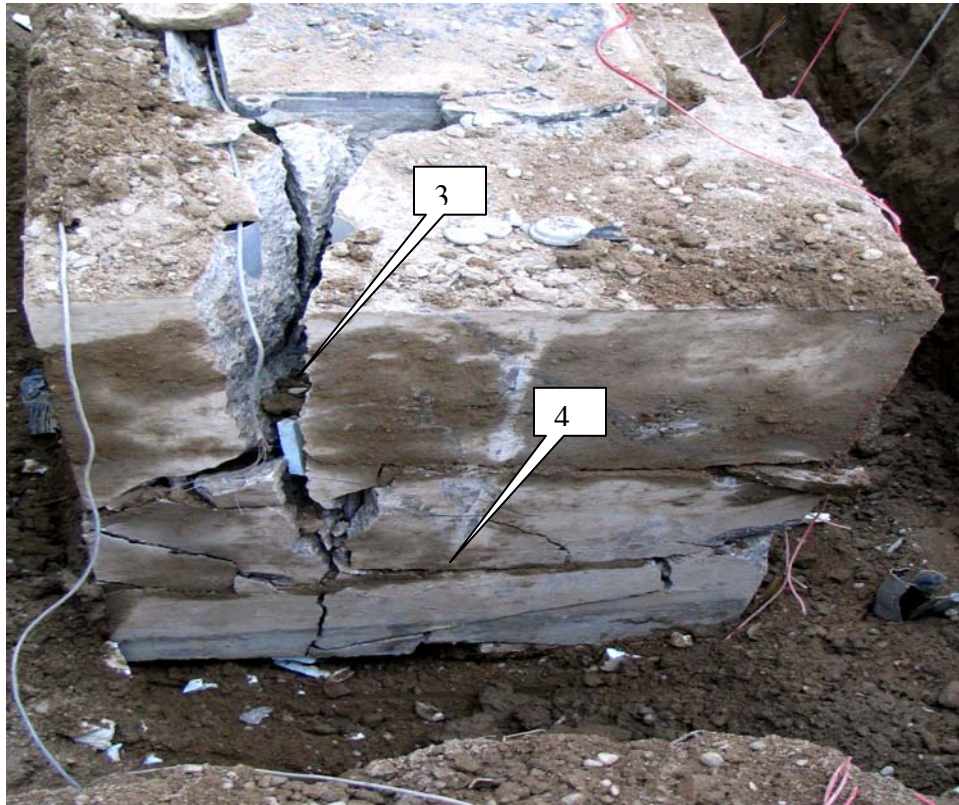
Transverse Face of Pile Cap after Failure
